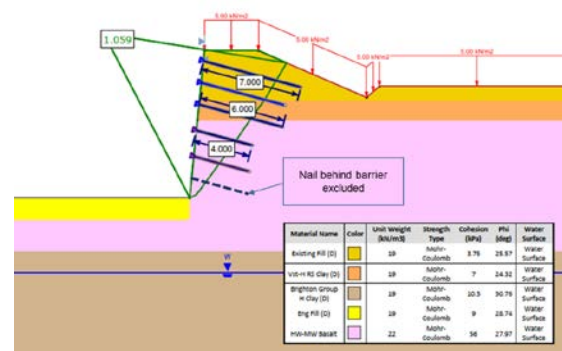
Soil Nail Wall Stability Analysis with the bottom nail excluded
